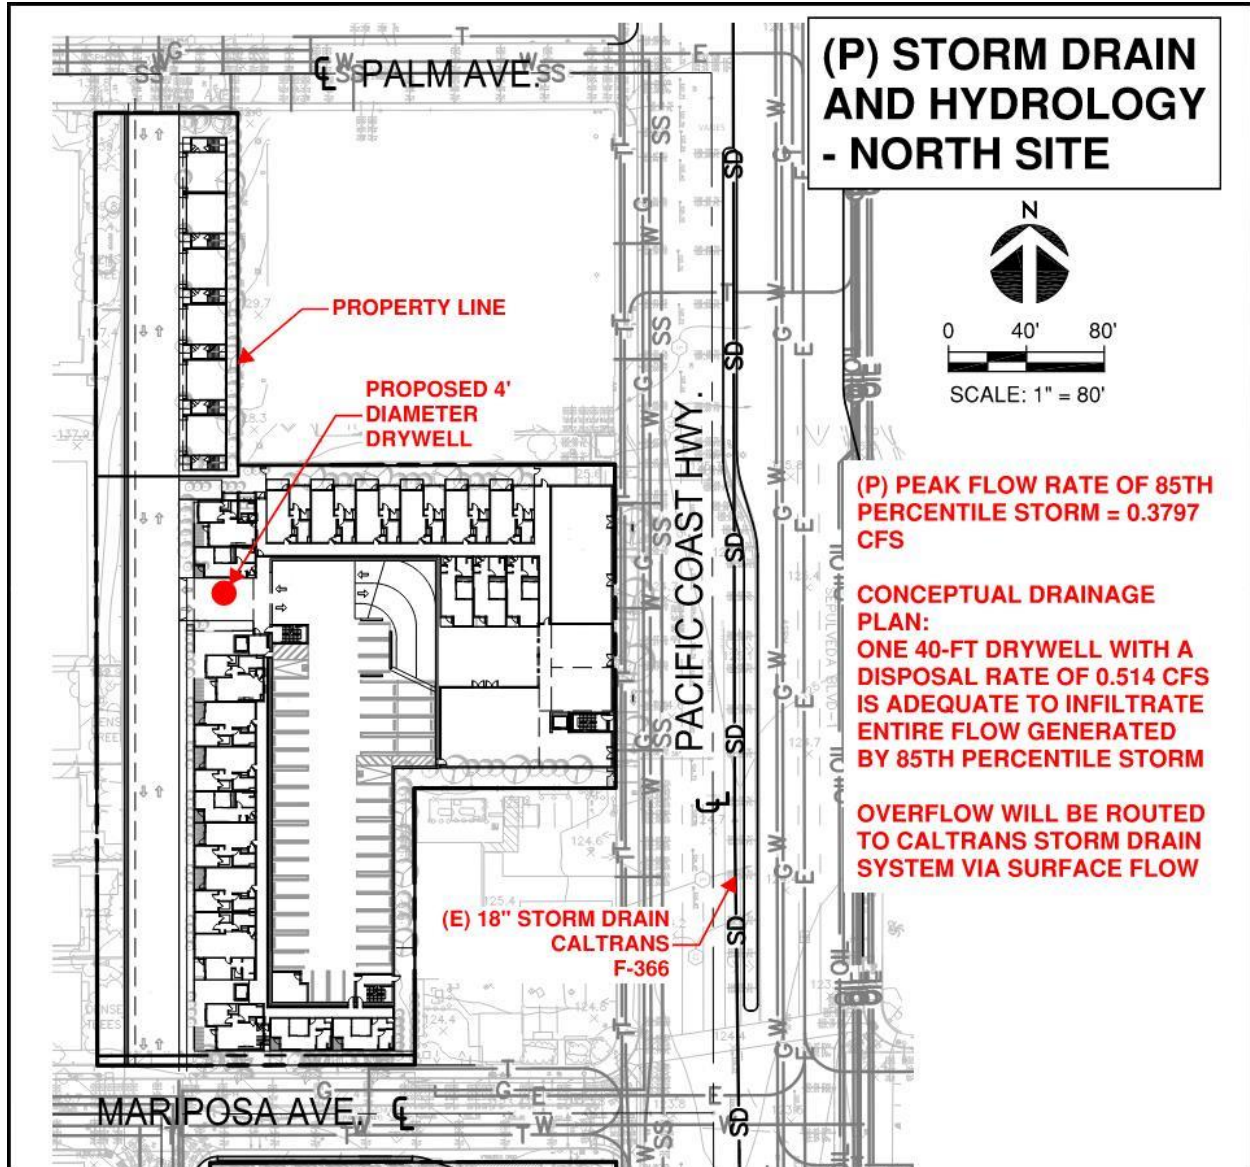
D CONCEPTUAL DRAINAGE PLAN FAIRFIELD PARKING SITE IN THE PCC COM-3 DISTRICT
